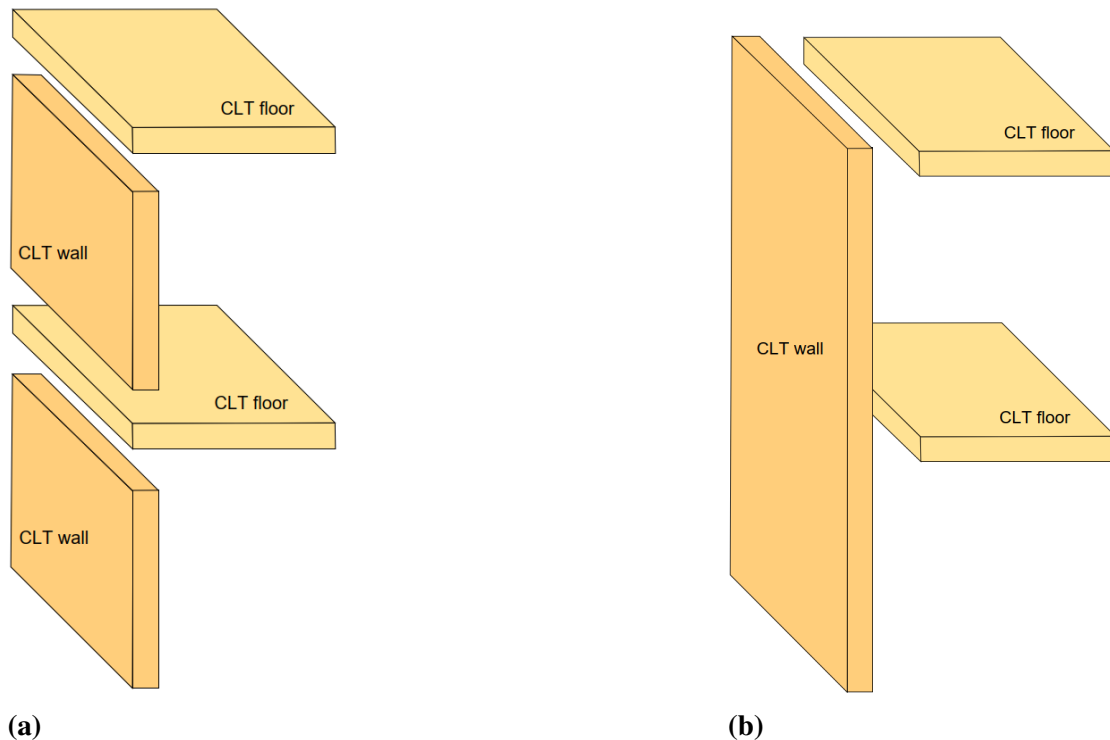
(a) Platform type and (b) balloon type of construction (own illustration).
